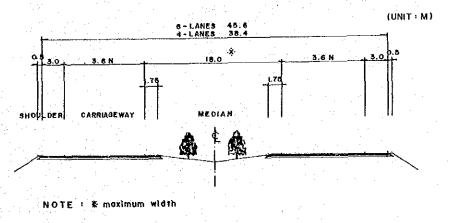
TYPICAL CROSS SECTION OF PRIMARY SYSTEM (1)
